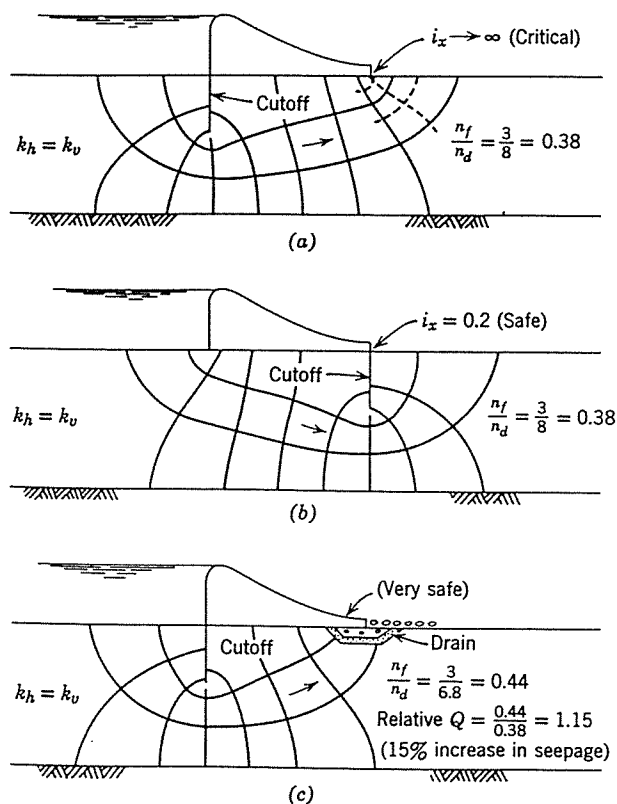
Flow net study of seepage control measures versus safety against piping ($k_h = k_v$). (a) Cutoff wall under upstream toe, no drain. (b) Cutoff wall under downstream toe, no drain. (c) Cutoff wall under upstream toe and drain at downstream toe.
